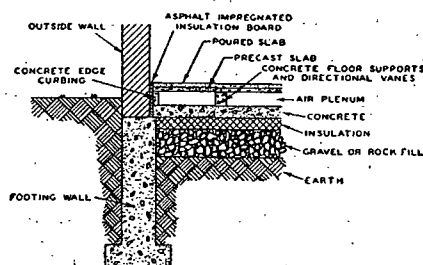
WARM AIR FLOOR PANEL CONSTRUCTION
